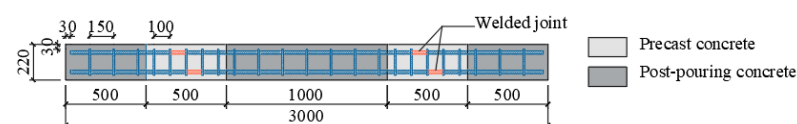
PC beam reinforcement welding joint positions: plane view (unit: mm).
